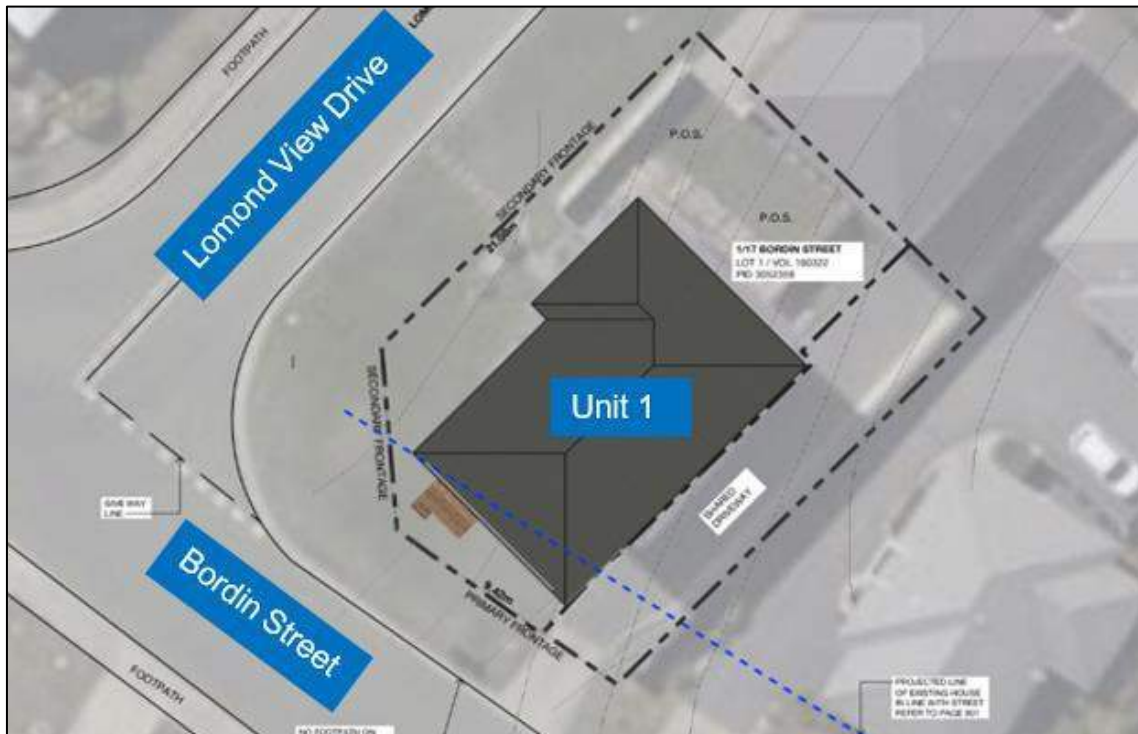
Proposed roofed area of Unit 1, showing that the building extends forward towards Bordin Street.
